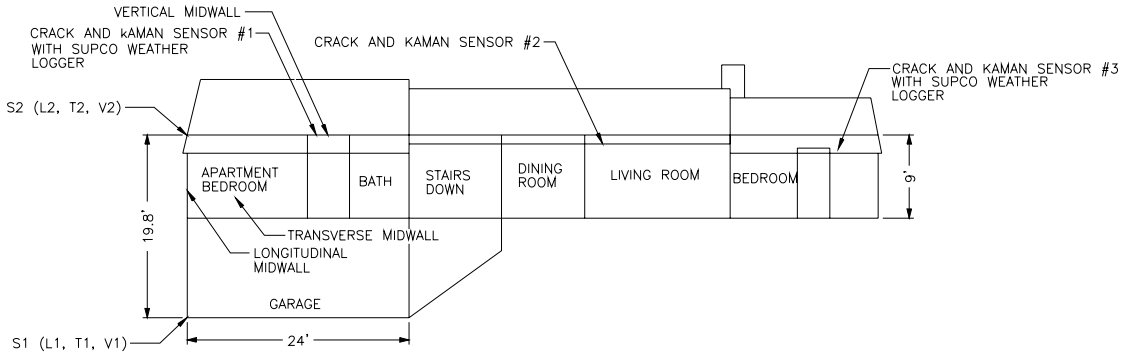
Elevation View of Connecticut House with Crack and Sensor Locations
